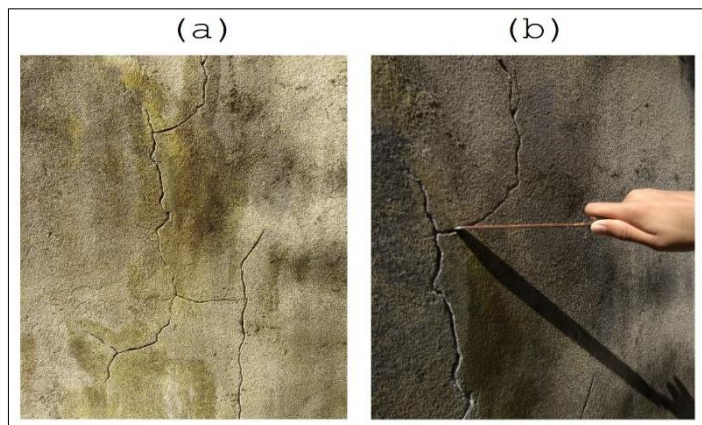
(a) Occurrence of cracks in the masonry wall, and (b) crack depth measurement. Source: Authors, (2020).
